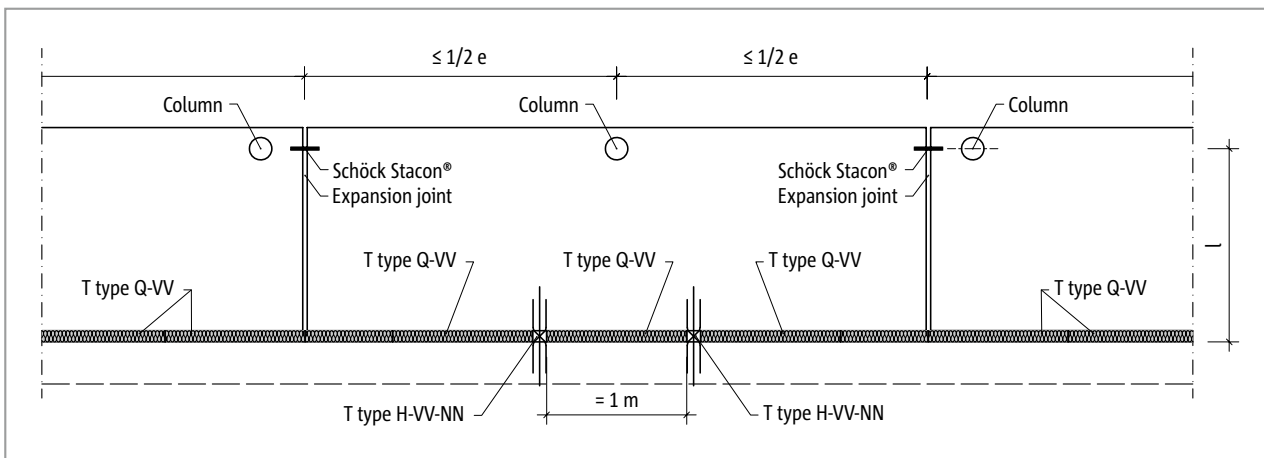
Schöck Isokorb® T type H: Expansion joint layout
